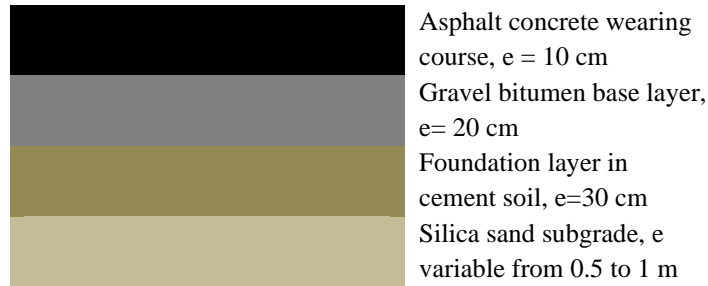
Cross-section of the test semi-grained asphalt concrete pavement
